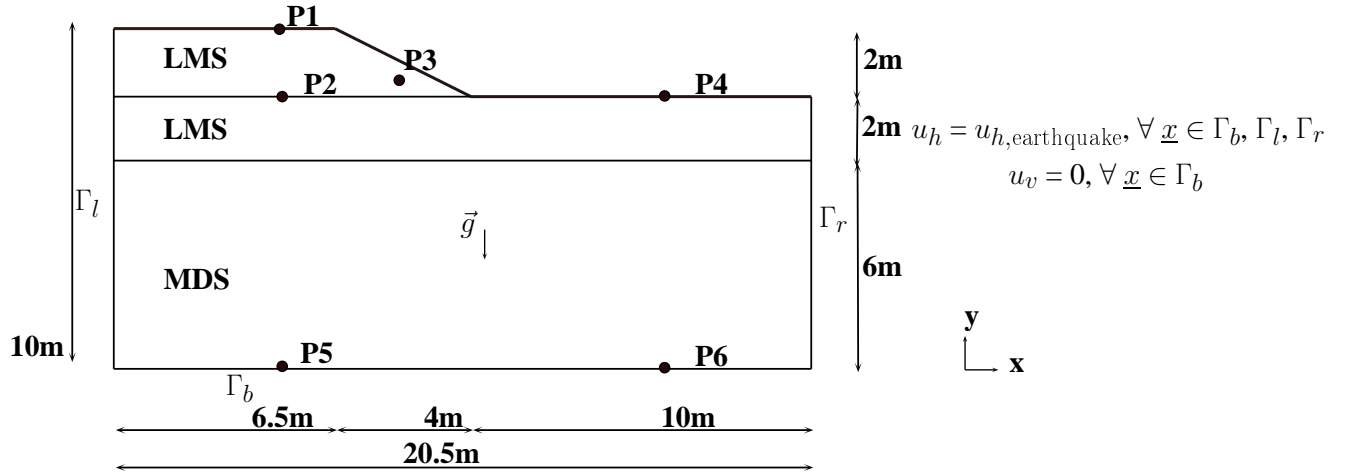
Numerical model of dry embankment resting on dense dry substratum.
